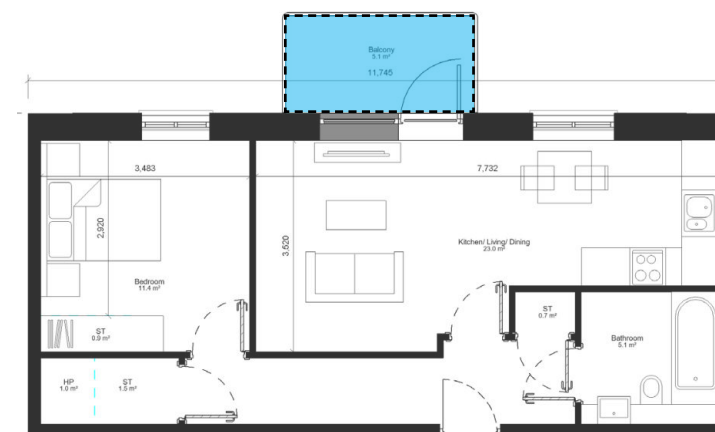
Proposed 1 Bedroom Apartment Layout - Apartment Block
